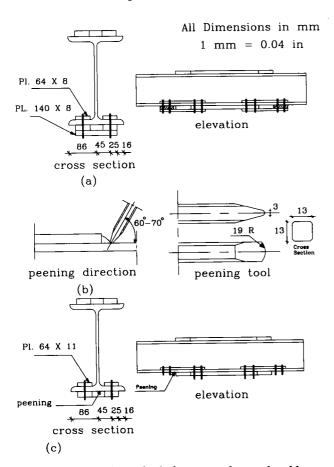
Repair methods for cover plate end welds: (a) bolted splice connection; (b) air-hammer peening; (c) partial bolted splice connection.
